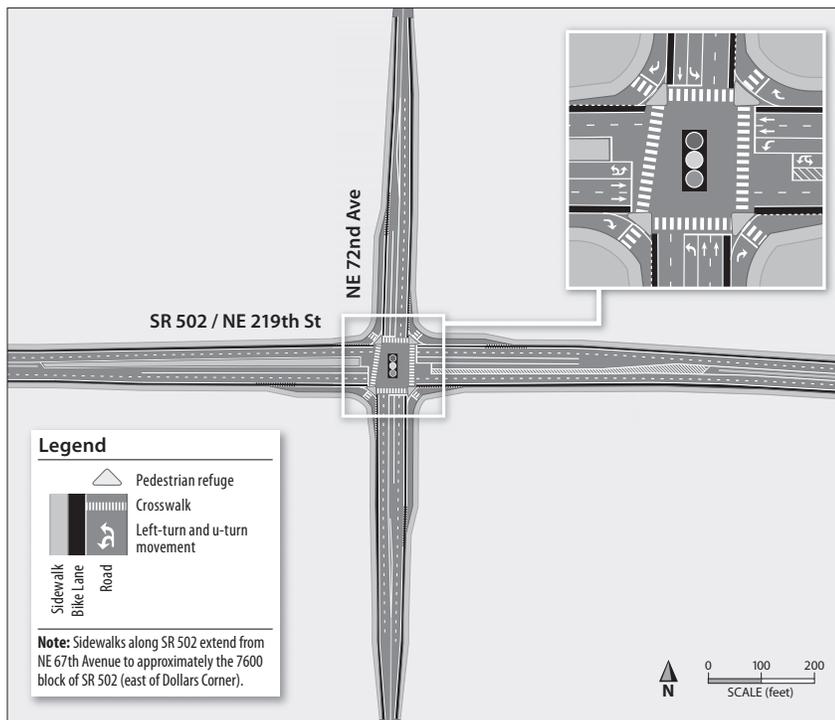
Proposed intersection of SR 502 and NE 72nd Ave under the Build Alternative
